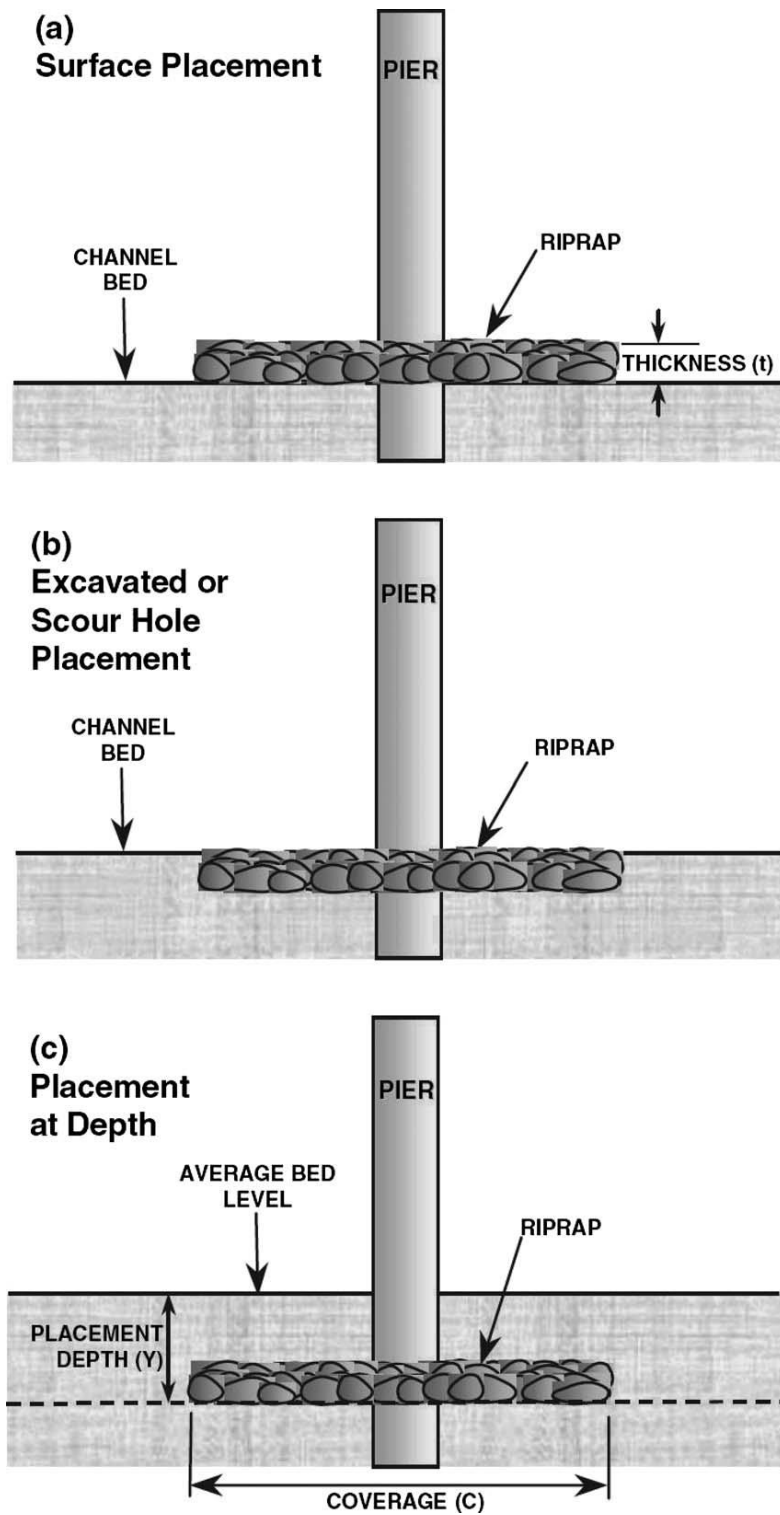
Pier Protection against Scouring Using Riprap [Reprinted from Lagasse et al., (2007)]
